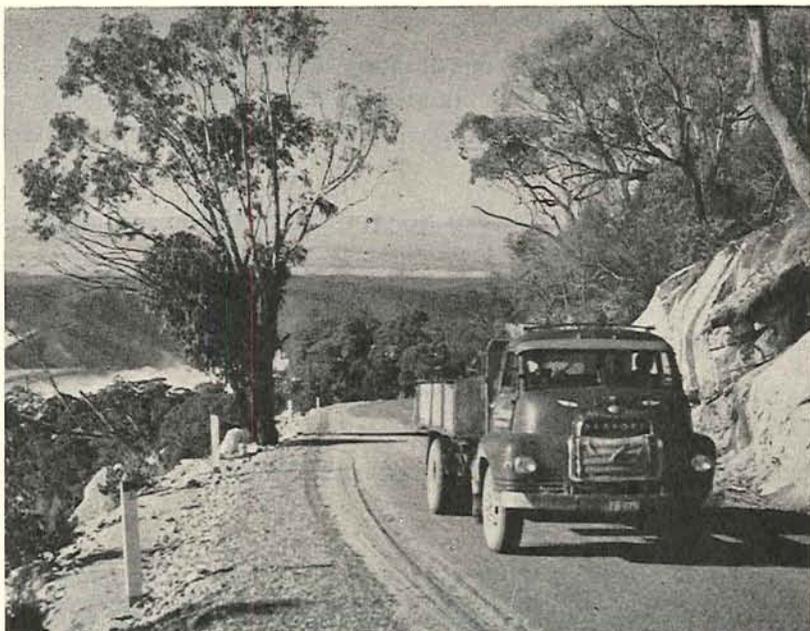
Mt. Buffalo Road—Reconstructed section below Staker's Lookout.
